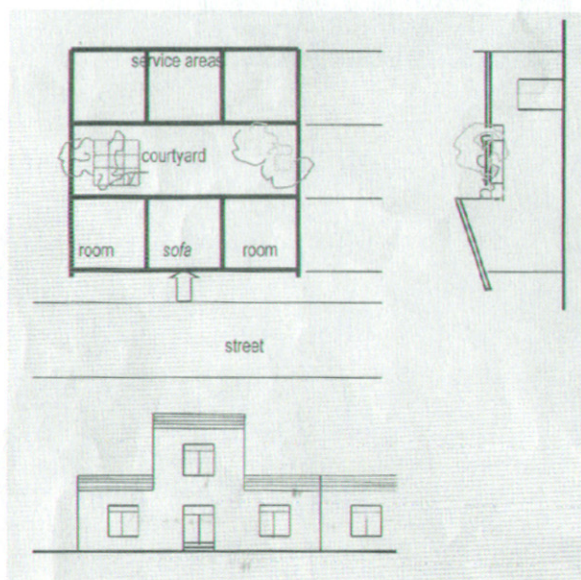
Typical plan and elevation of an Akdoan (Lysi) in house.
